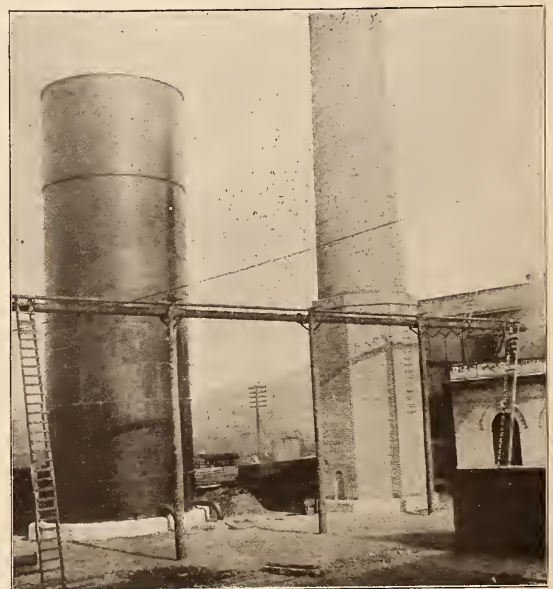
VIEW NEAR POWER HOUSE, C., M. & ST. P. RY.
